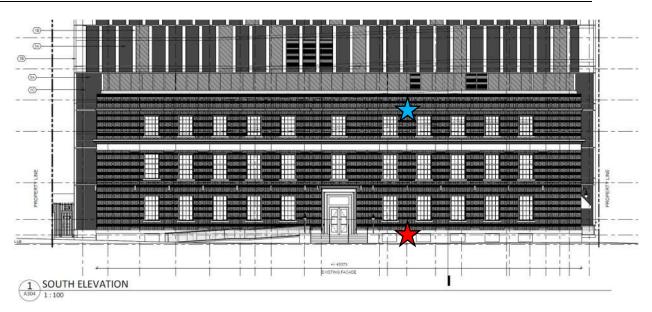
Part South Elevation, indicating proposed locations of vibration monitors.
